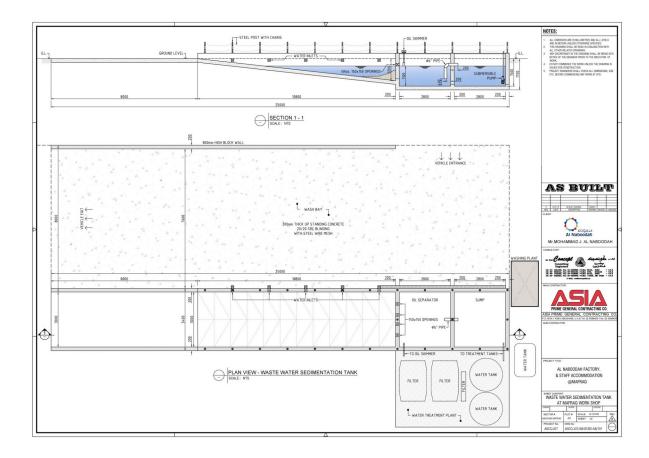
Wash bay, layout plan with details of waste water sedimentation tanks at NP workshop Abu Dhabi
